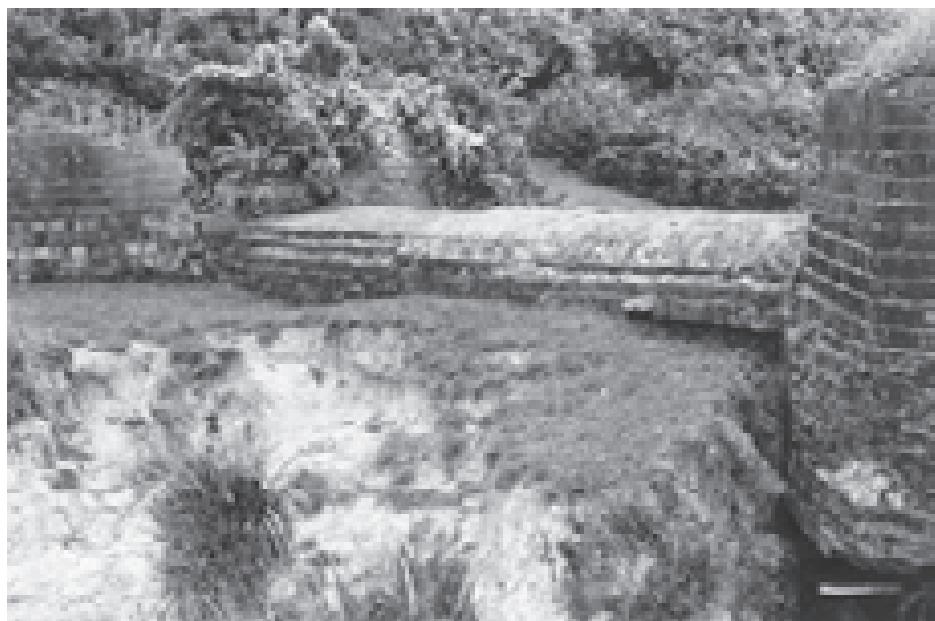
In the south Wairarapa a dam of bricks made on the property once provided water to a sheep station boiling down plant, for tallow production before development of the refrigerated meat trade (N. Prickett).
